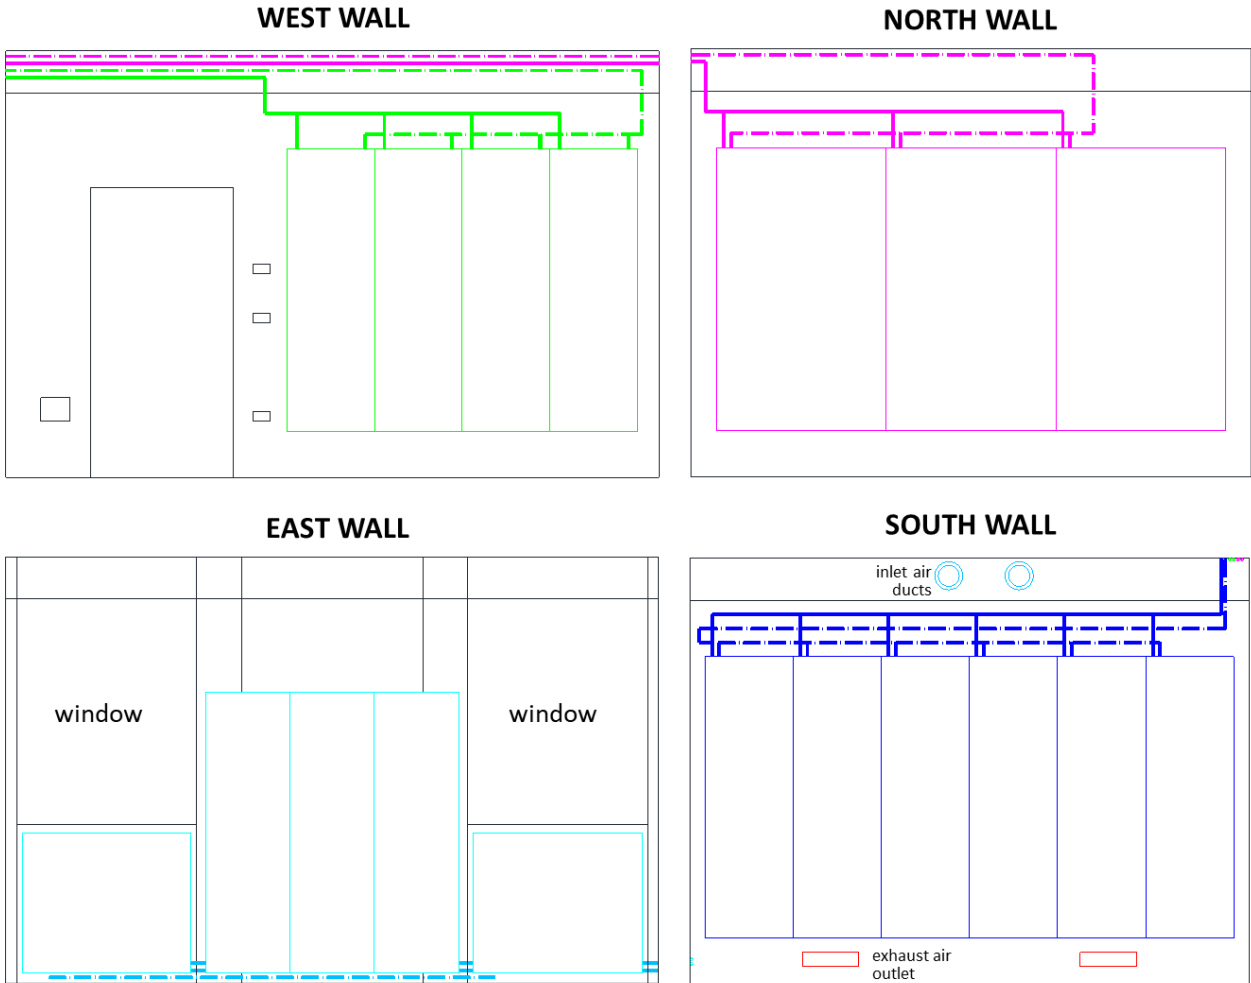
Layout and hydronic connections of the radiant panels on the walls.
